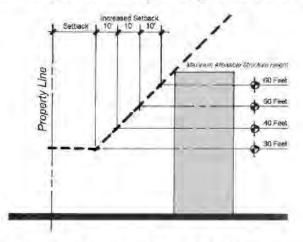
APPLICATION NO. 6-15-0142
